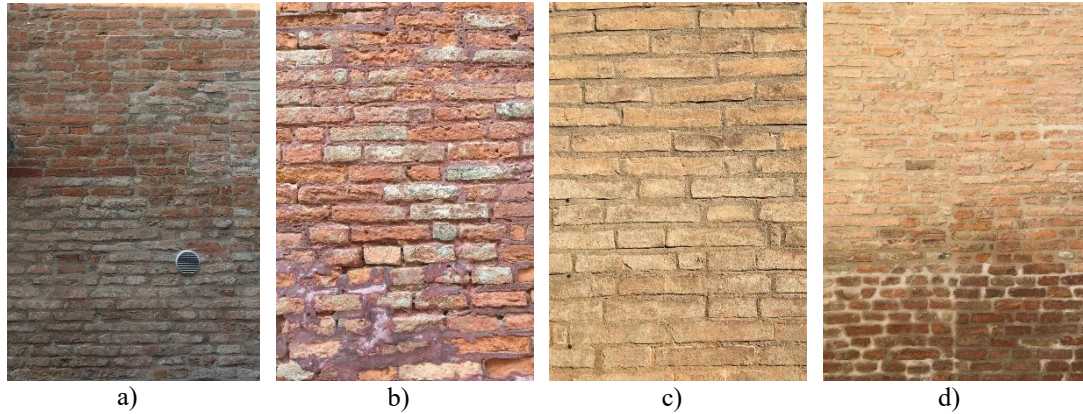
types of clay brick walls in Ferrara for MUR1 and MUR2 class.
